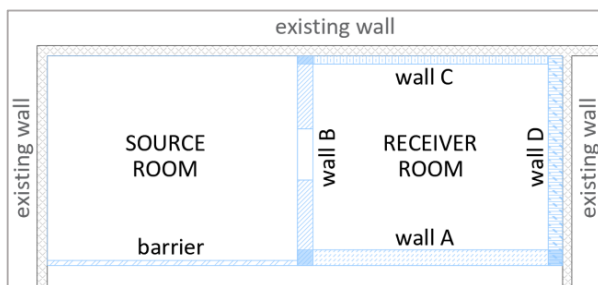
Floorplan of the test facility: The existing structure is shown in grey and the new walls in blue.
